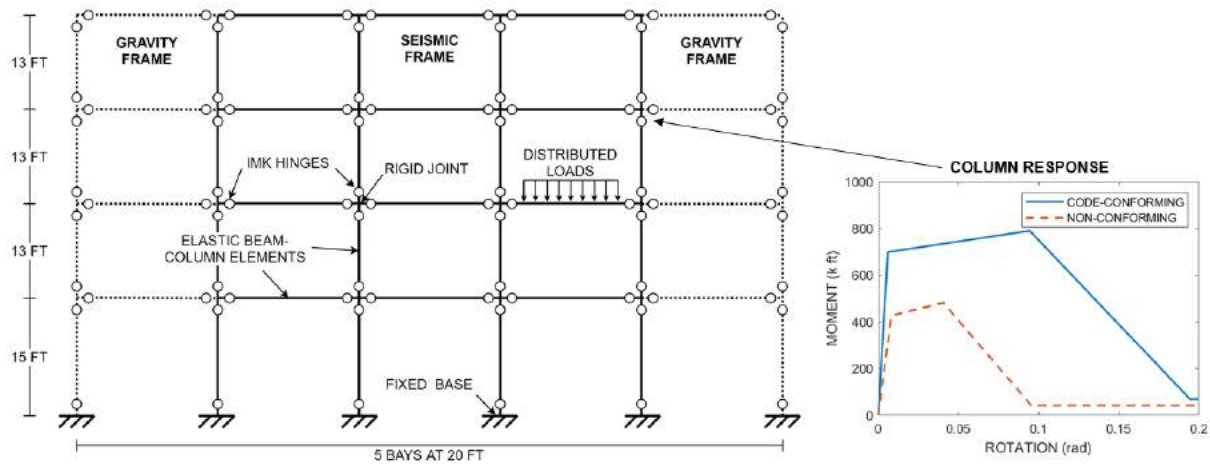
Diagram of geometry and modeling of exterior frames, with three-bay seismic-resisting bays perimeter frame and two gravity frame bays. Typical column backbones for perimeter frame in 4-story buildings definition are shown.
